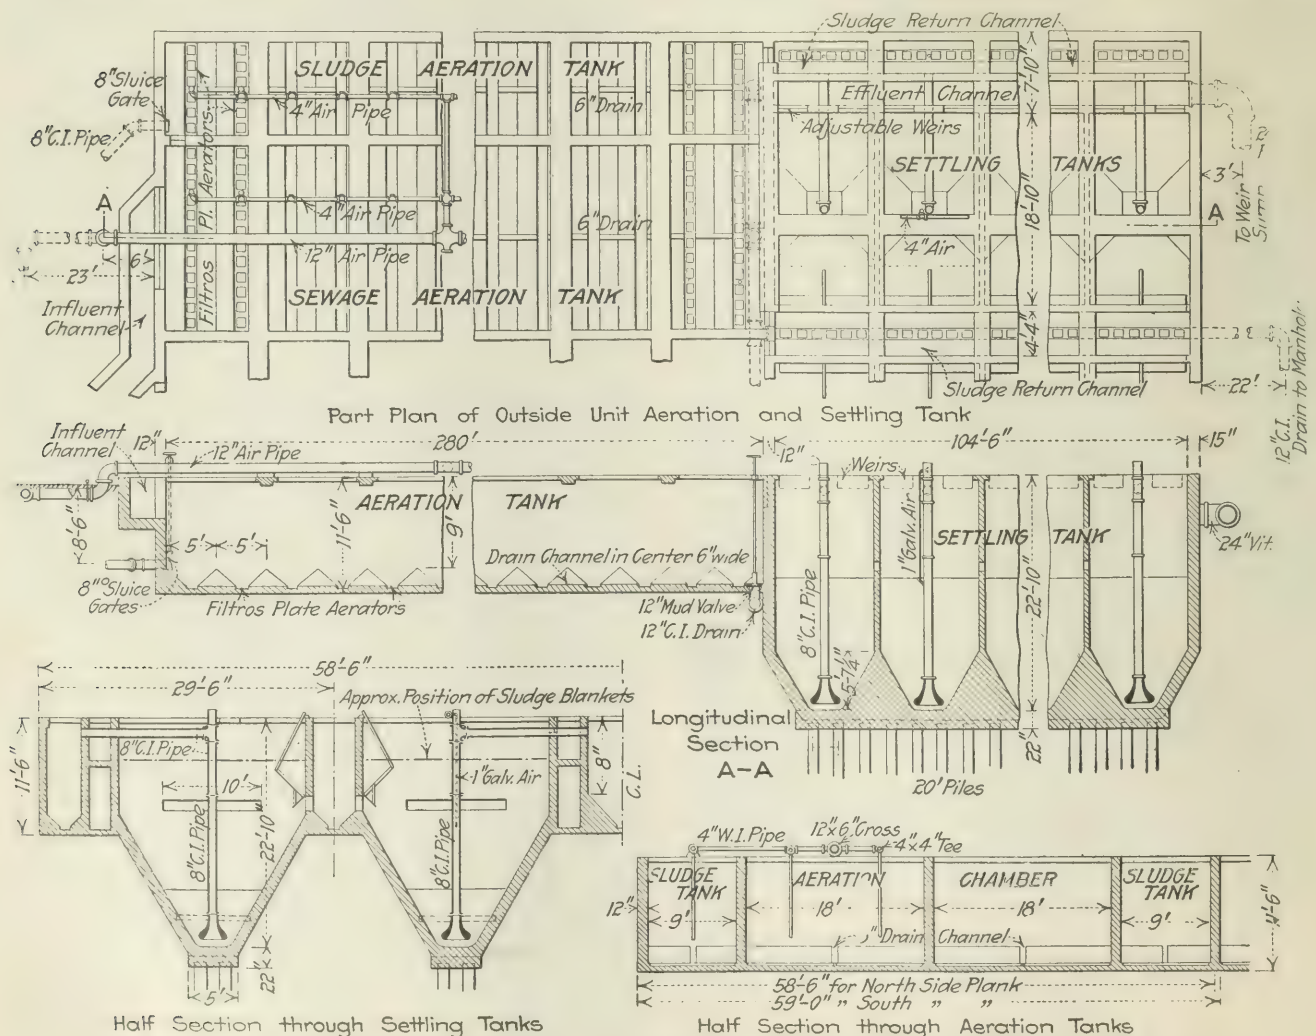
GENERAL PLAN AND SECTIONS OF PORTION OF ACTIVATED-SLUDGE UNIT, HOUSTON, TEX.
